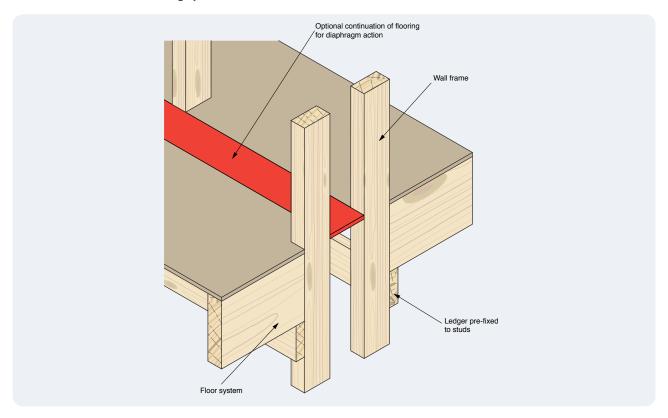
Platform floor frame with discontinuous double stud wall.
